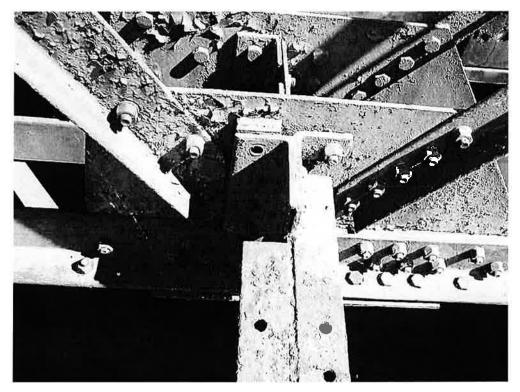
South tower outer truss at node L10: the diaphragm angle connection (also serves as outer connection angle for the utility support bracket) has a sheared / missing connection bolt.
